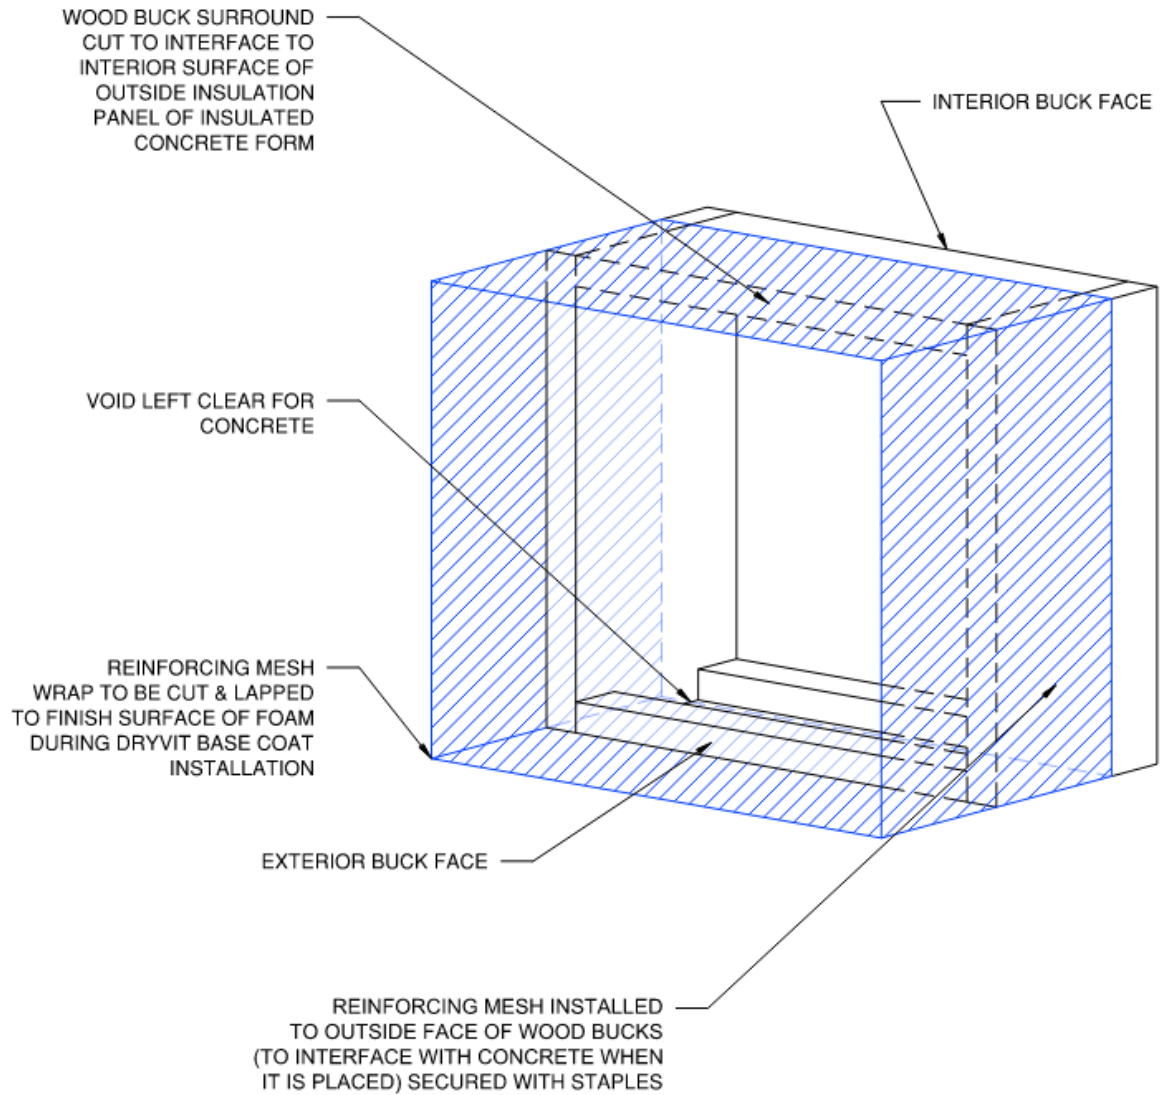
Exterior wall assembly incorporating EIFS reinforcement mesh at wall opening.
